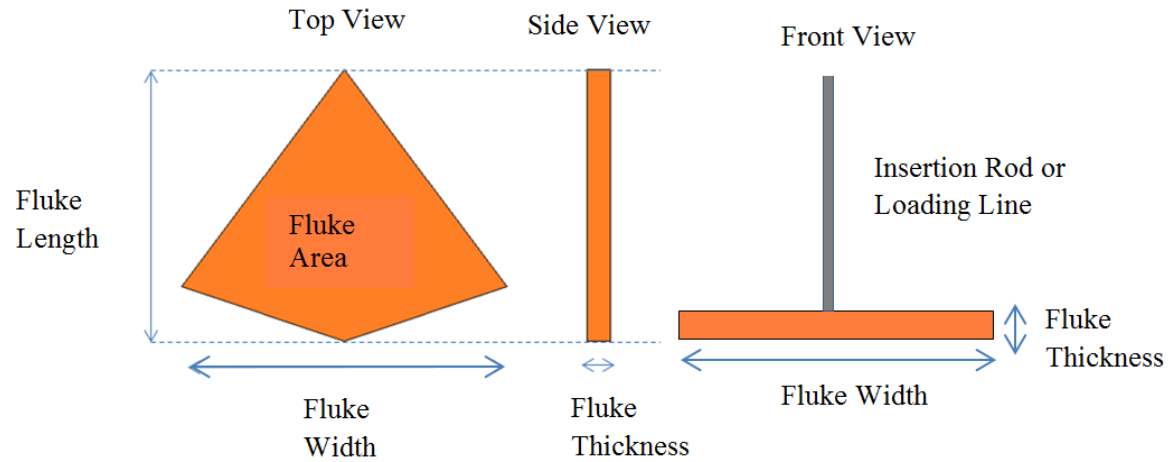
Schematic drawing of the diamond-shaped bearing plate
